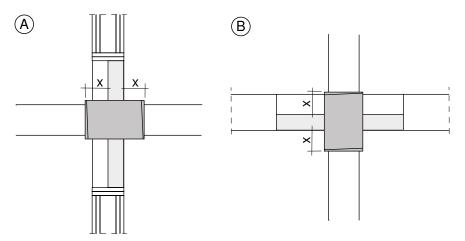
Fire protection bandage on non-combustible pipes in wall and ceiling
